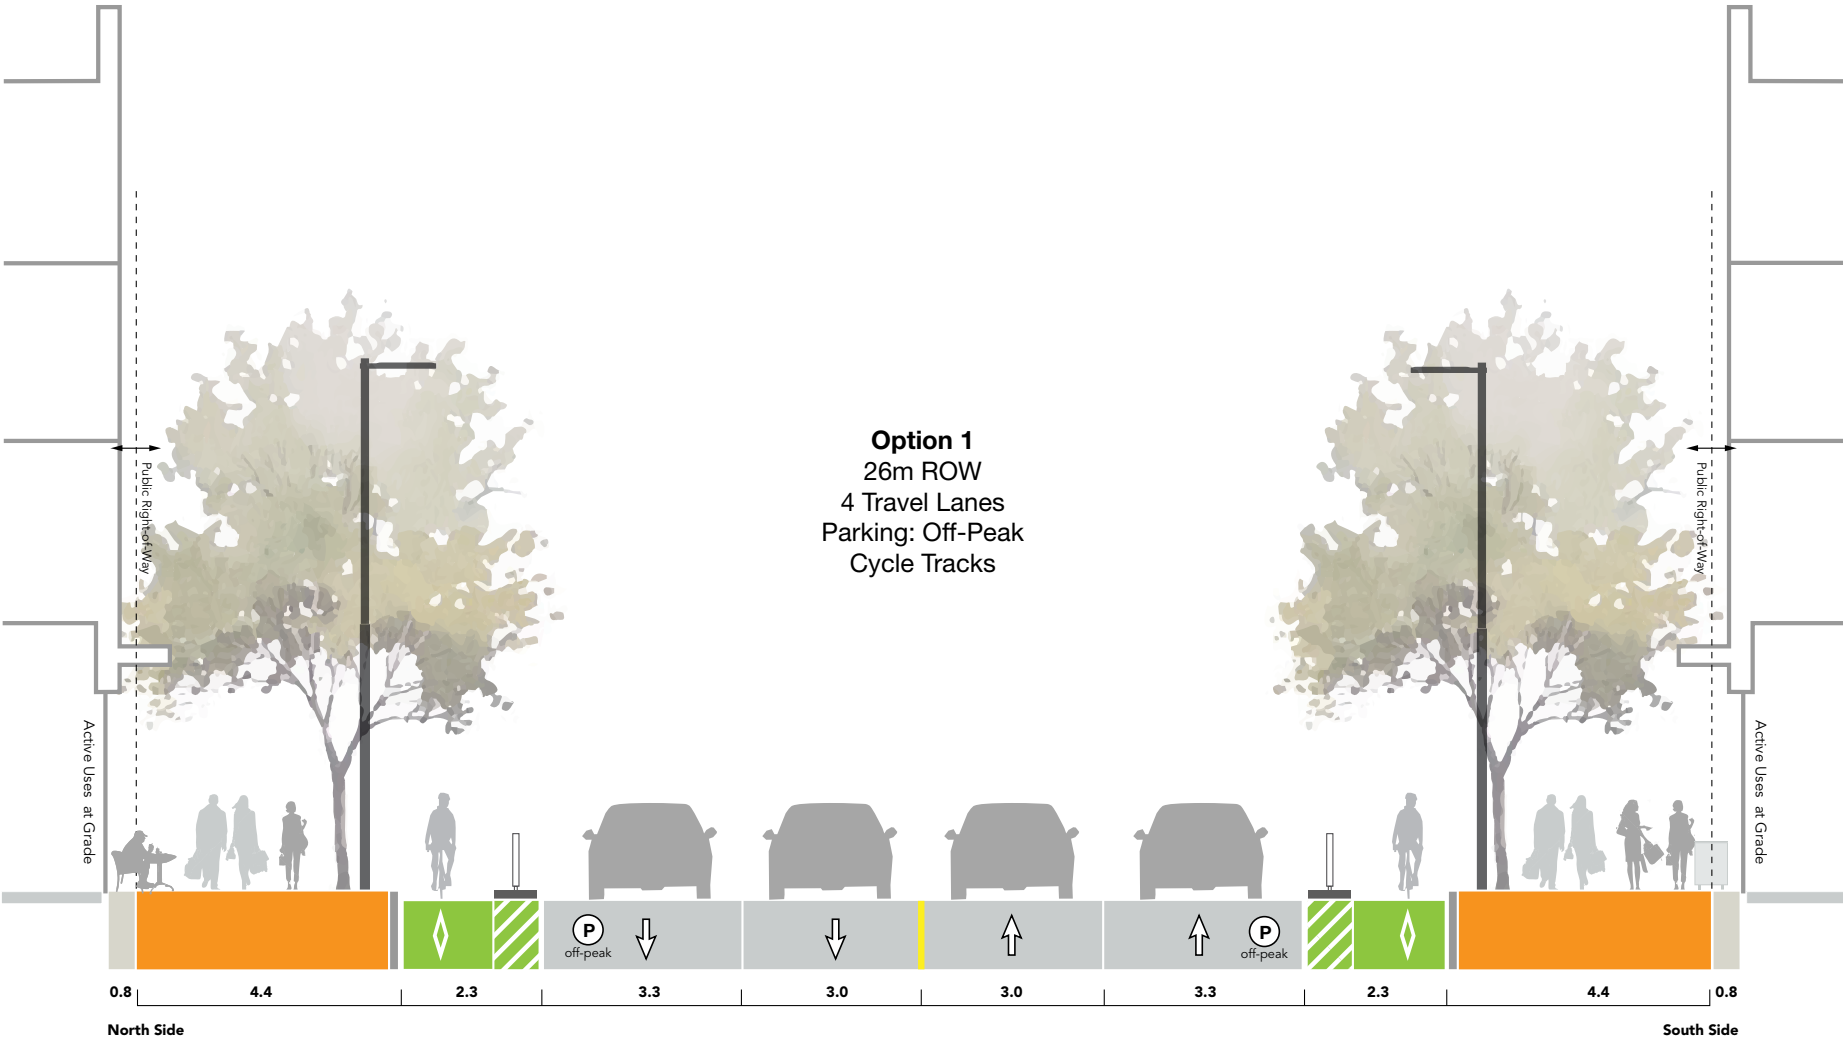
Bloor Street West. 26m ROW. Option 1
